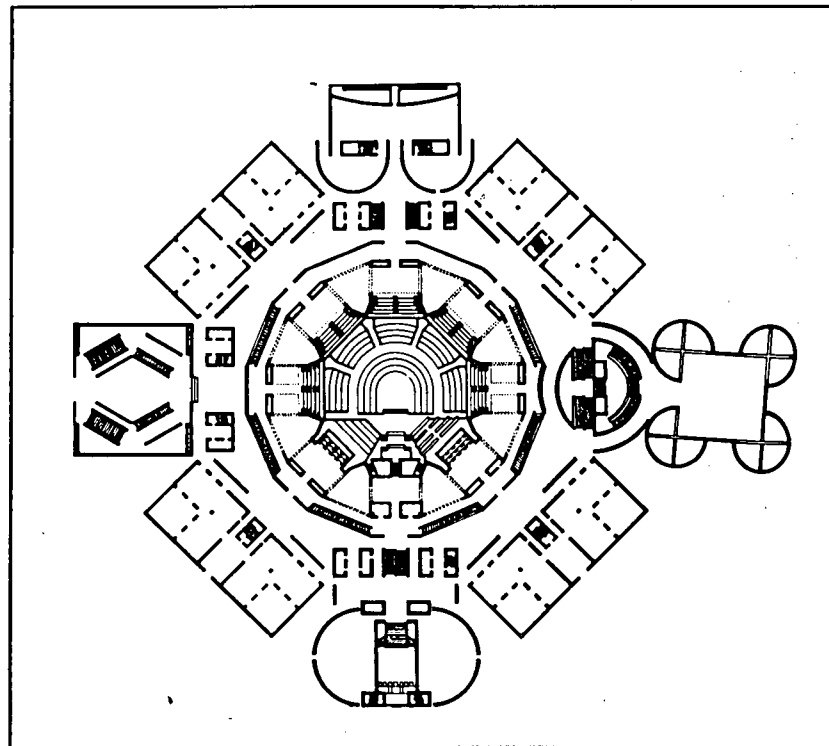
; Plan of Paliament Bulding, Dacca by Louis I. Kahn - 1963
